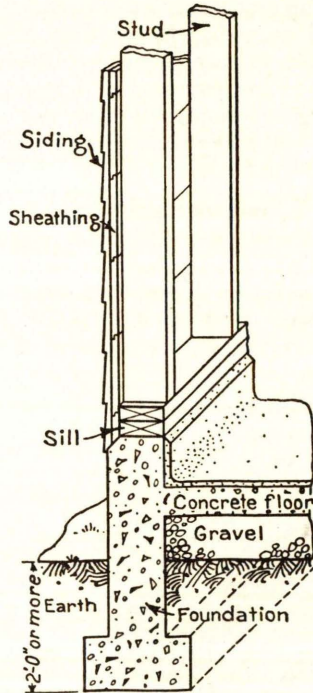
Foundation and floor suitable for most types of farm buildings.
